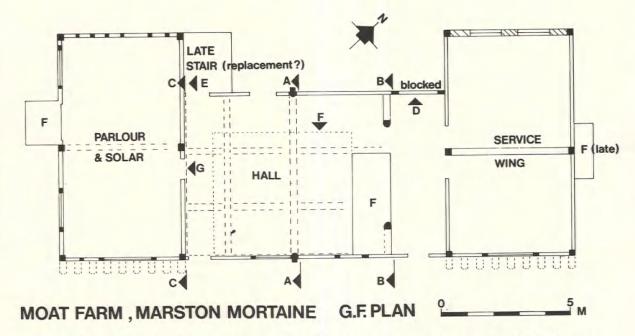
Moat Farm, Marston Mortaine. Ground Floor Plan. The modern partitions in the hall are shown by short dash lines. Existing wall stude are shown, but apart from the principal posts, most are not original. A-C refer to sections. D-F refer to door head elevations.
